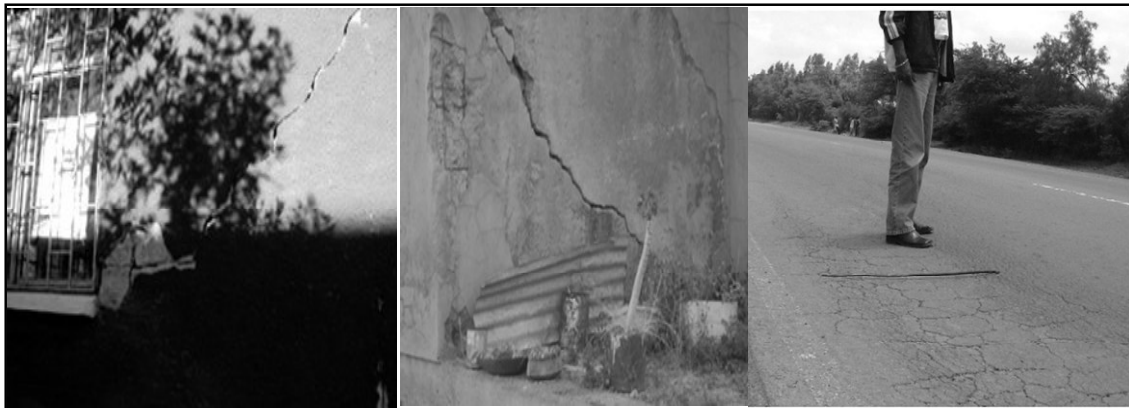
Damages to buildings and road infrastructures (field pictures) in the study area due to soil expansion and shrinking.
